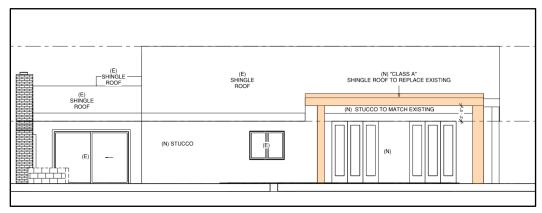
West elevation of residence with the reconstructed patio shown in orange
